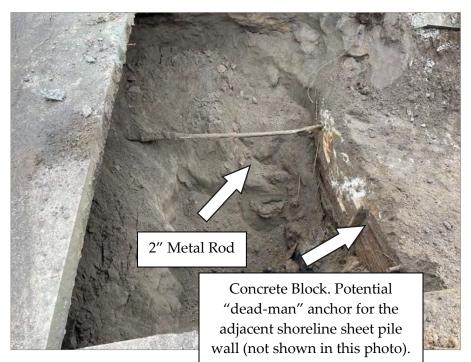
Area 8 – View of the West Half Final Extent of the Excavation. Photo taken on October 5, 2021. View direction is north. A metal rod and concrete block were observed in the excavation and are potential structural components of the adjacent sheet pile wall.
